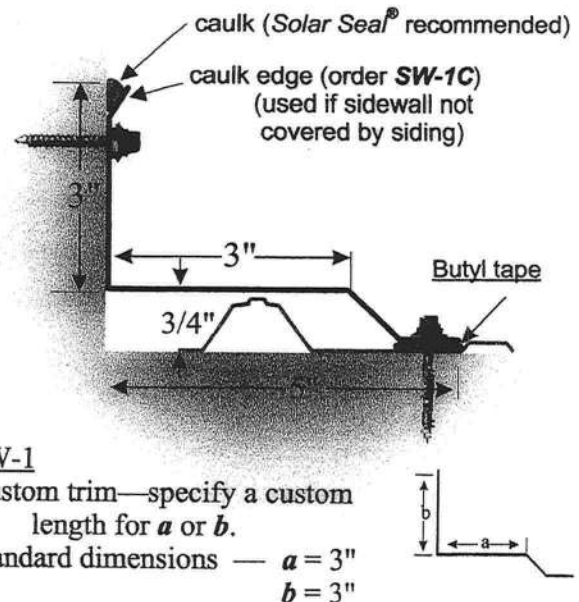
Sidewall flashing is applied when the side of the roof butts up against an adjacent wall. The wall-side of the flashing can either be covered over with siding or sealed with caulk (order SW-1C). Butyl tape should be applied where the "foot" of the flashing attaches to the roof.
